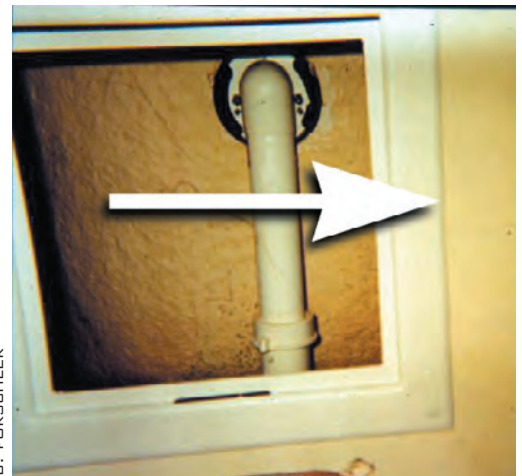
To facilitate termite inspections, property owners should consider the installation of inspection ports (arrow) at all utility access points.
